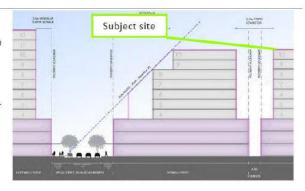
Subject site located one block north of Wells Street, with no potential overshadowing implications.
